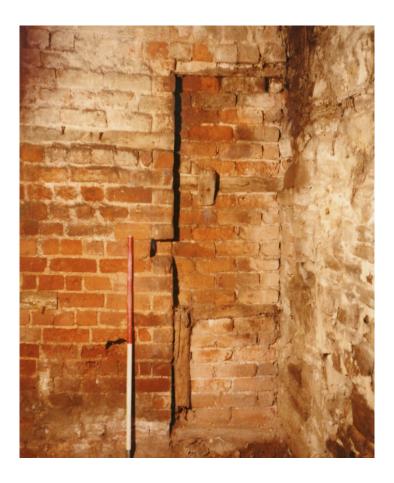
Room 1 detail of N-facing interior wall showing blocked doorway
